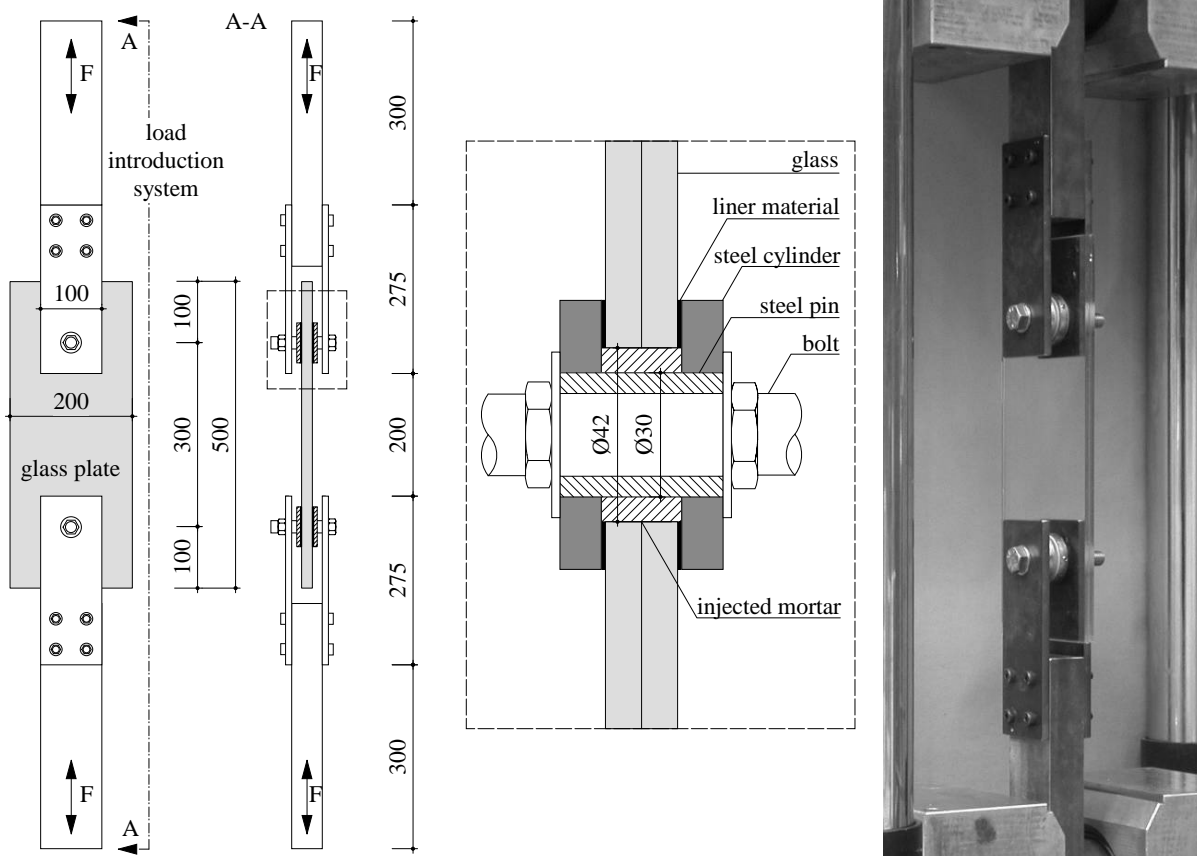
Axial rigid connection: plan view, side view, connection devices and specimen photo
